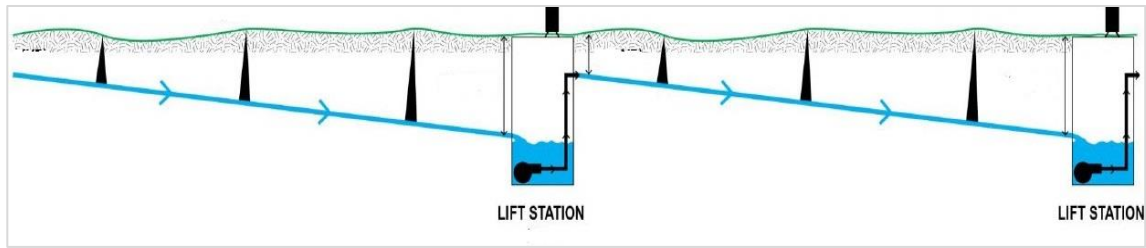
Typical gravity sewer and lift station profile (Gilbert, 2013)
